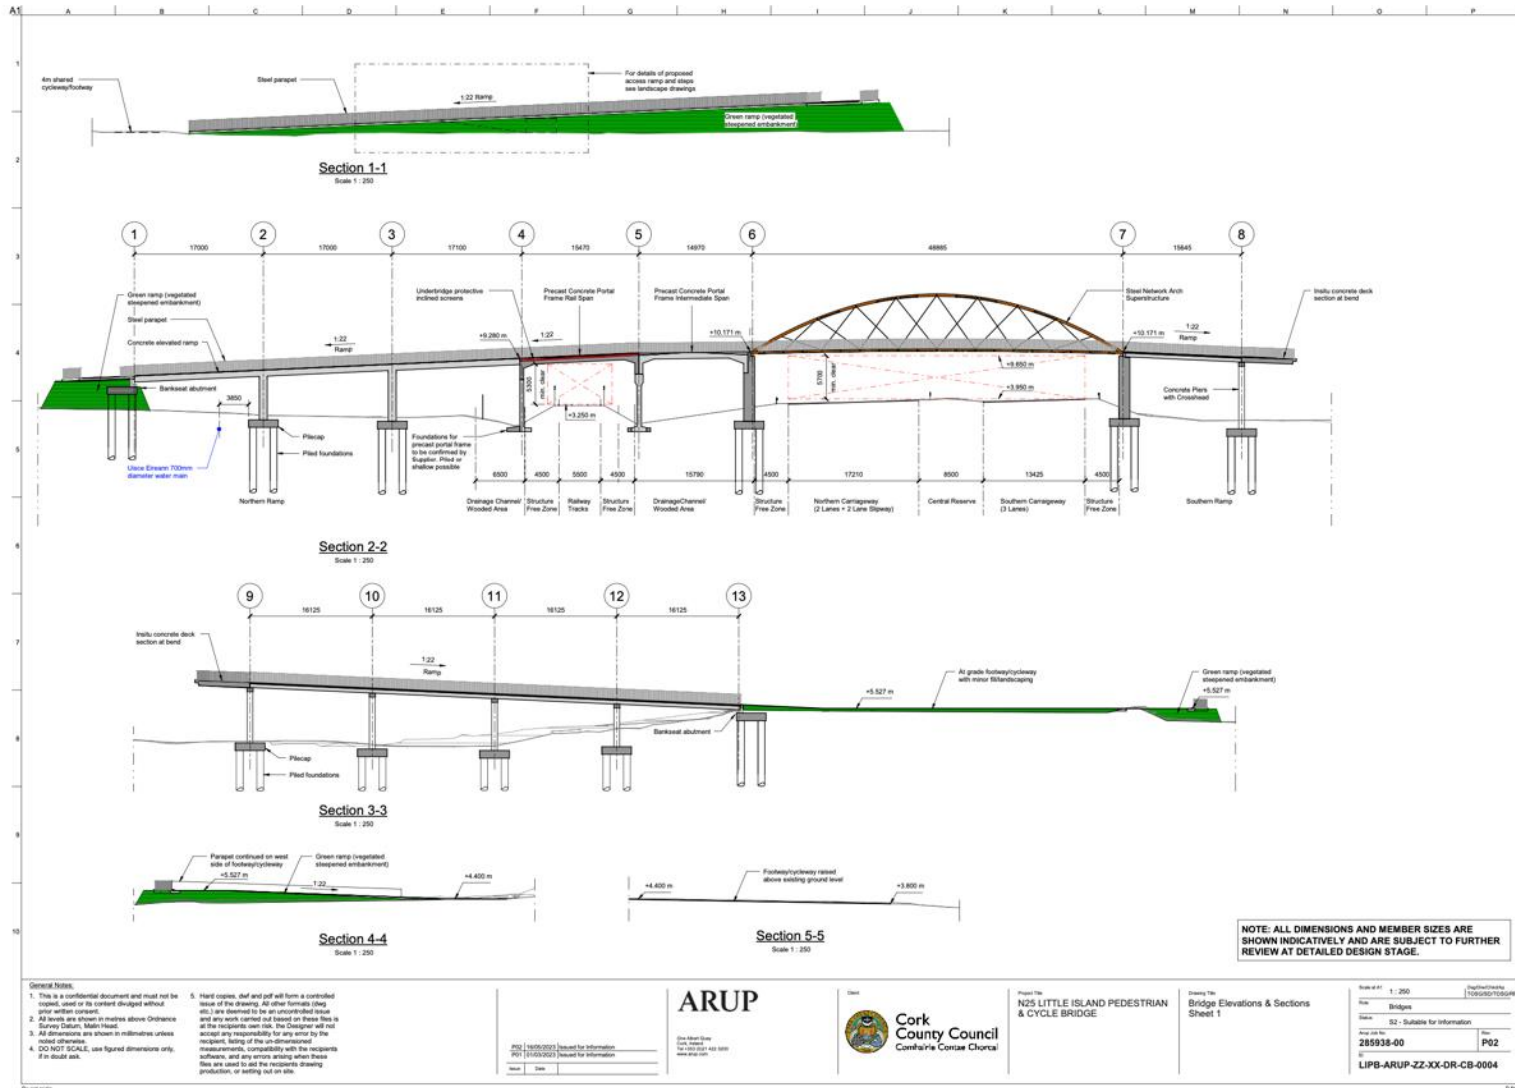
Proposed design of pedestrian and cycle bridge site elevations | Source Arup
